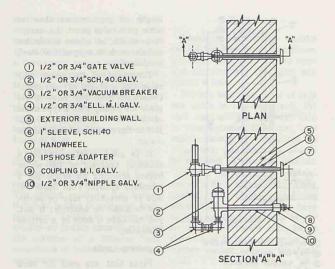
Vacuum breaker arrangement for outside hose hydrant.
